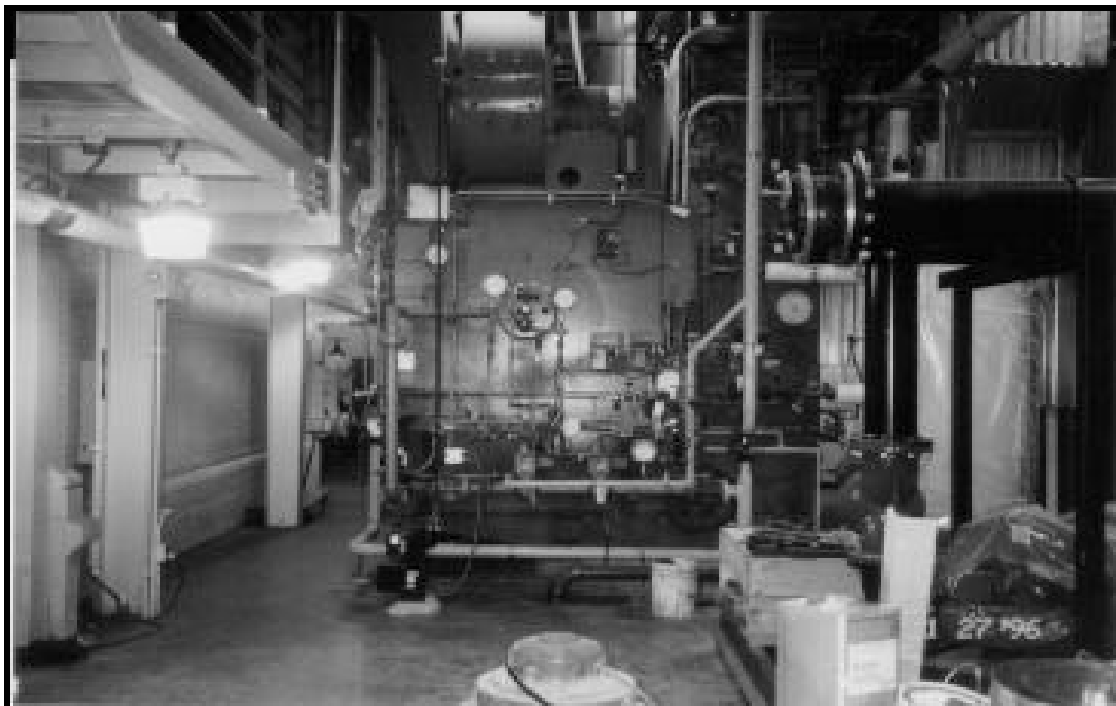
Boiler 109 showing burner and forced draft fan at the top of the boiler (typical for Boiler 110 and Boiler 107)
